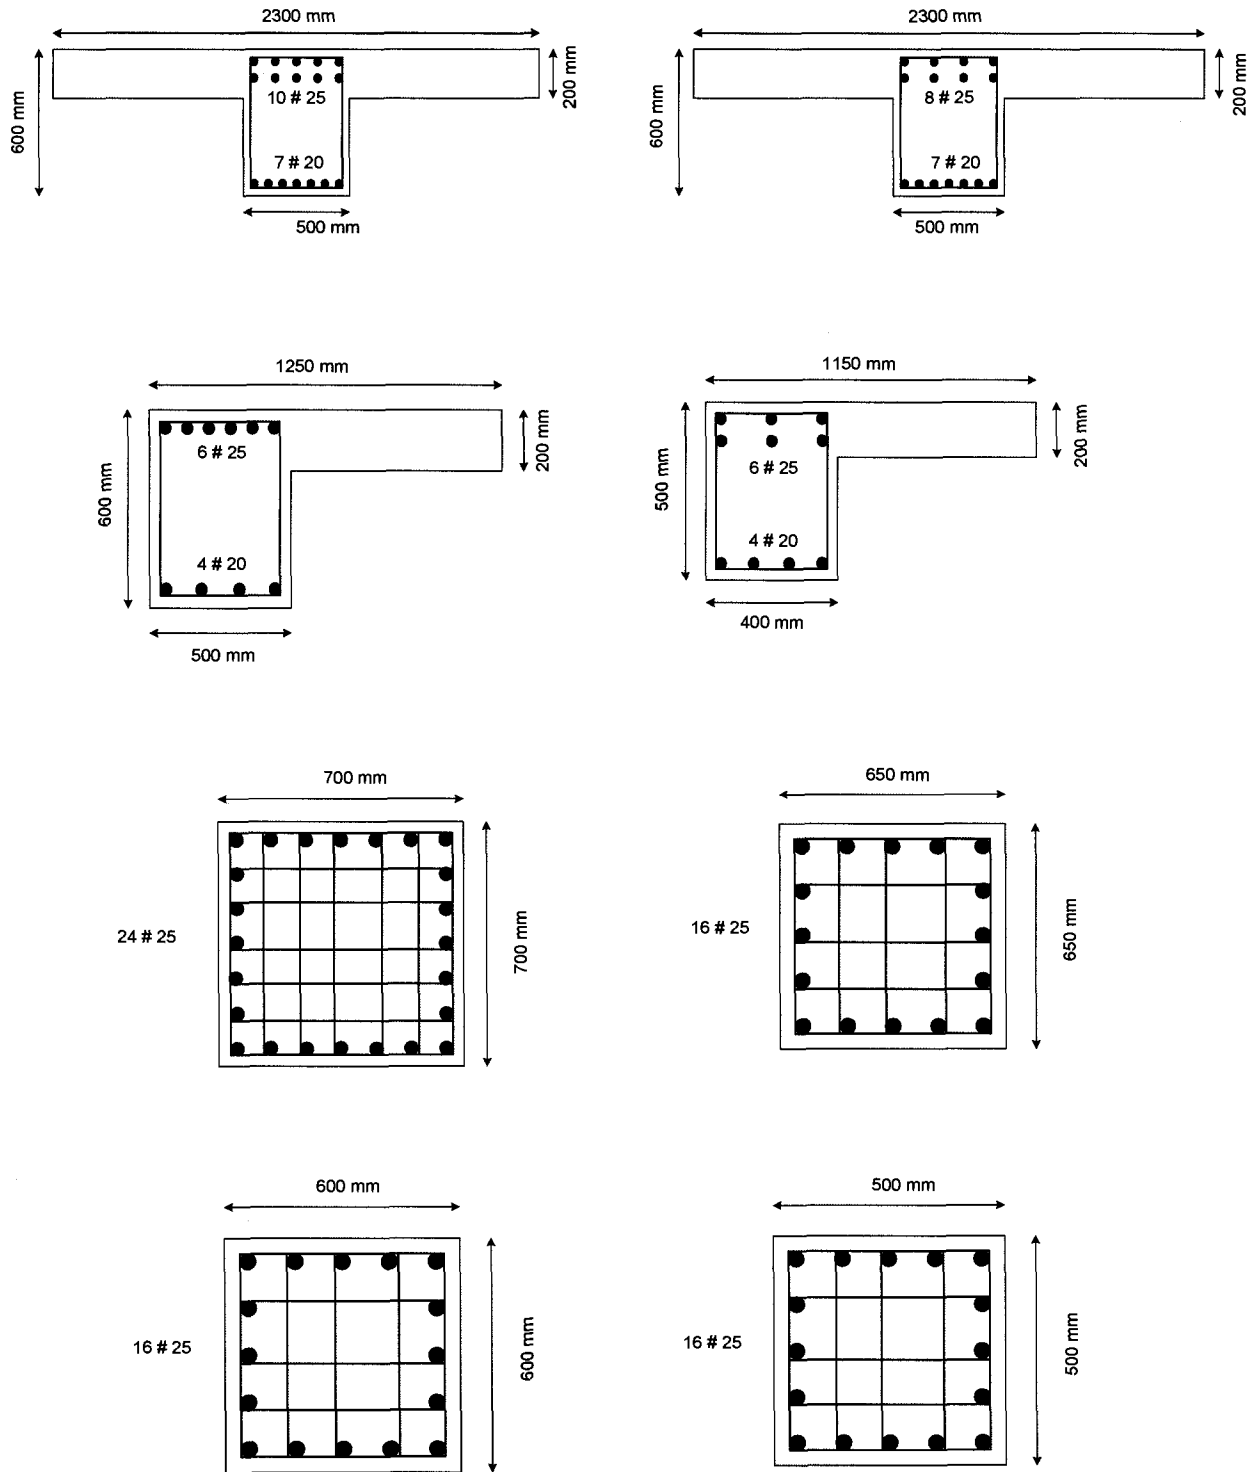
Design details for frame elements of 5-storey reinforced concrete building with 9.0 m spans
